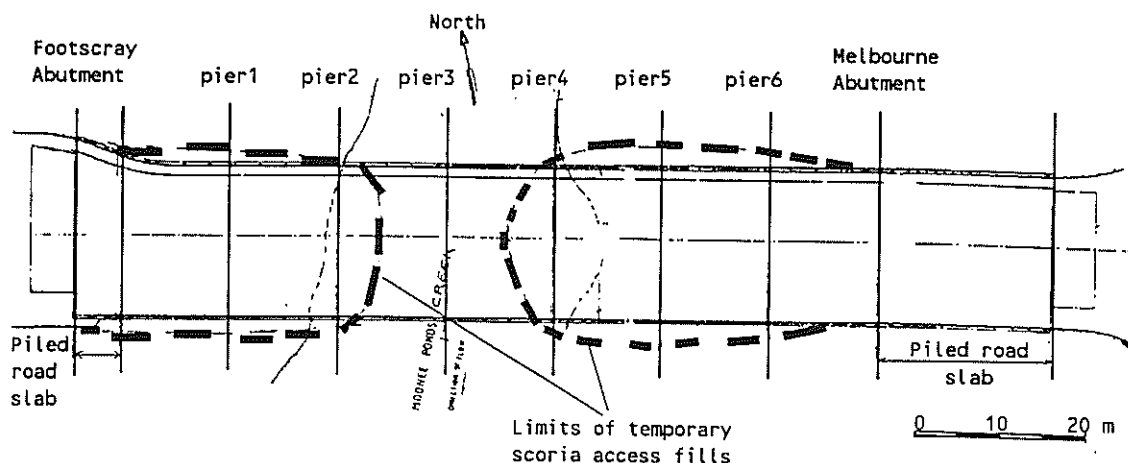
Bridge site plan - Moonee Ponds Creek, Melbourne.
